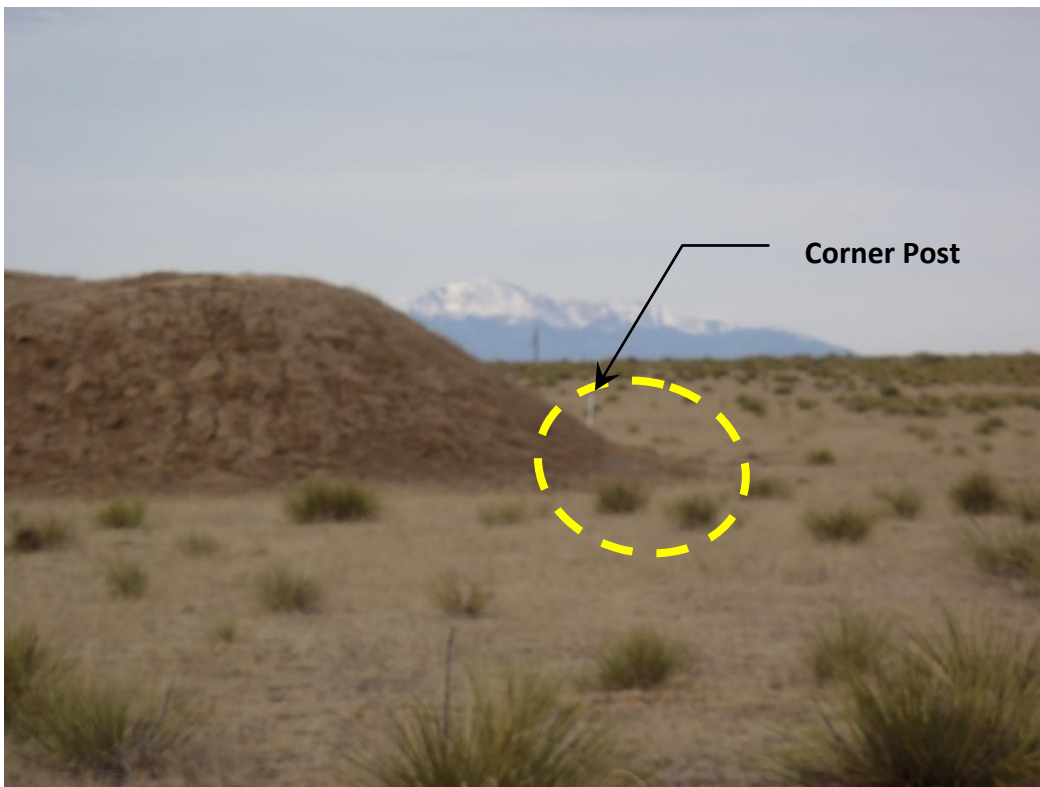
Topsoil stockpile outside permit boundary (looking west).
